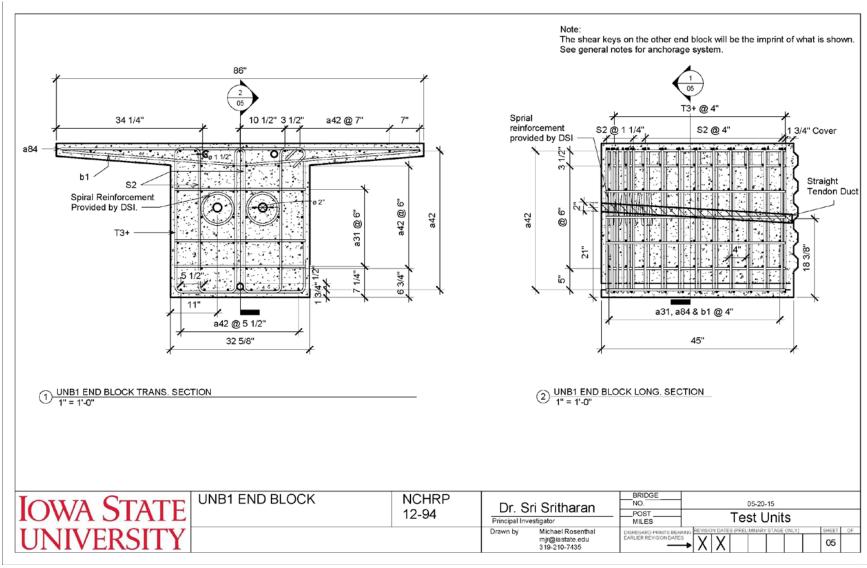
UNB1 End Block Longitudinal and Transverse Section
